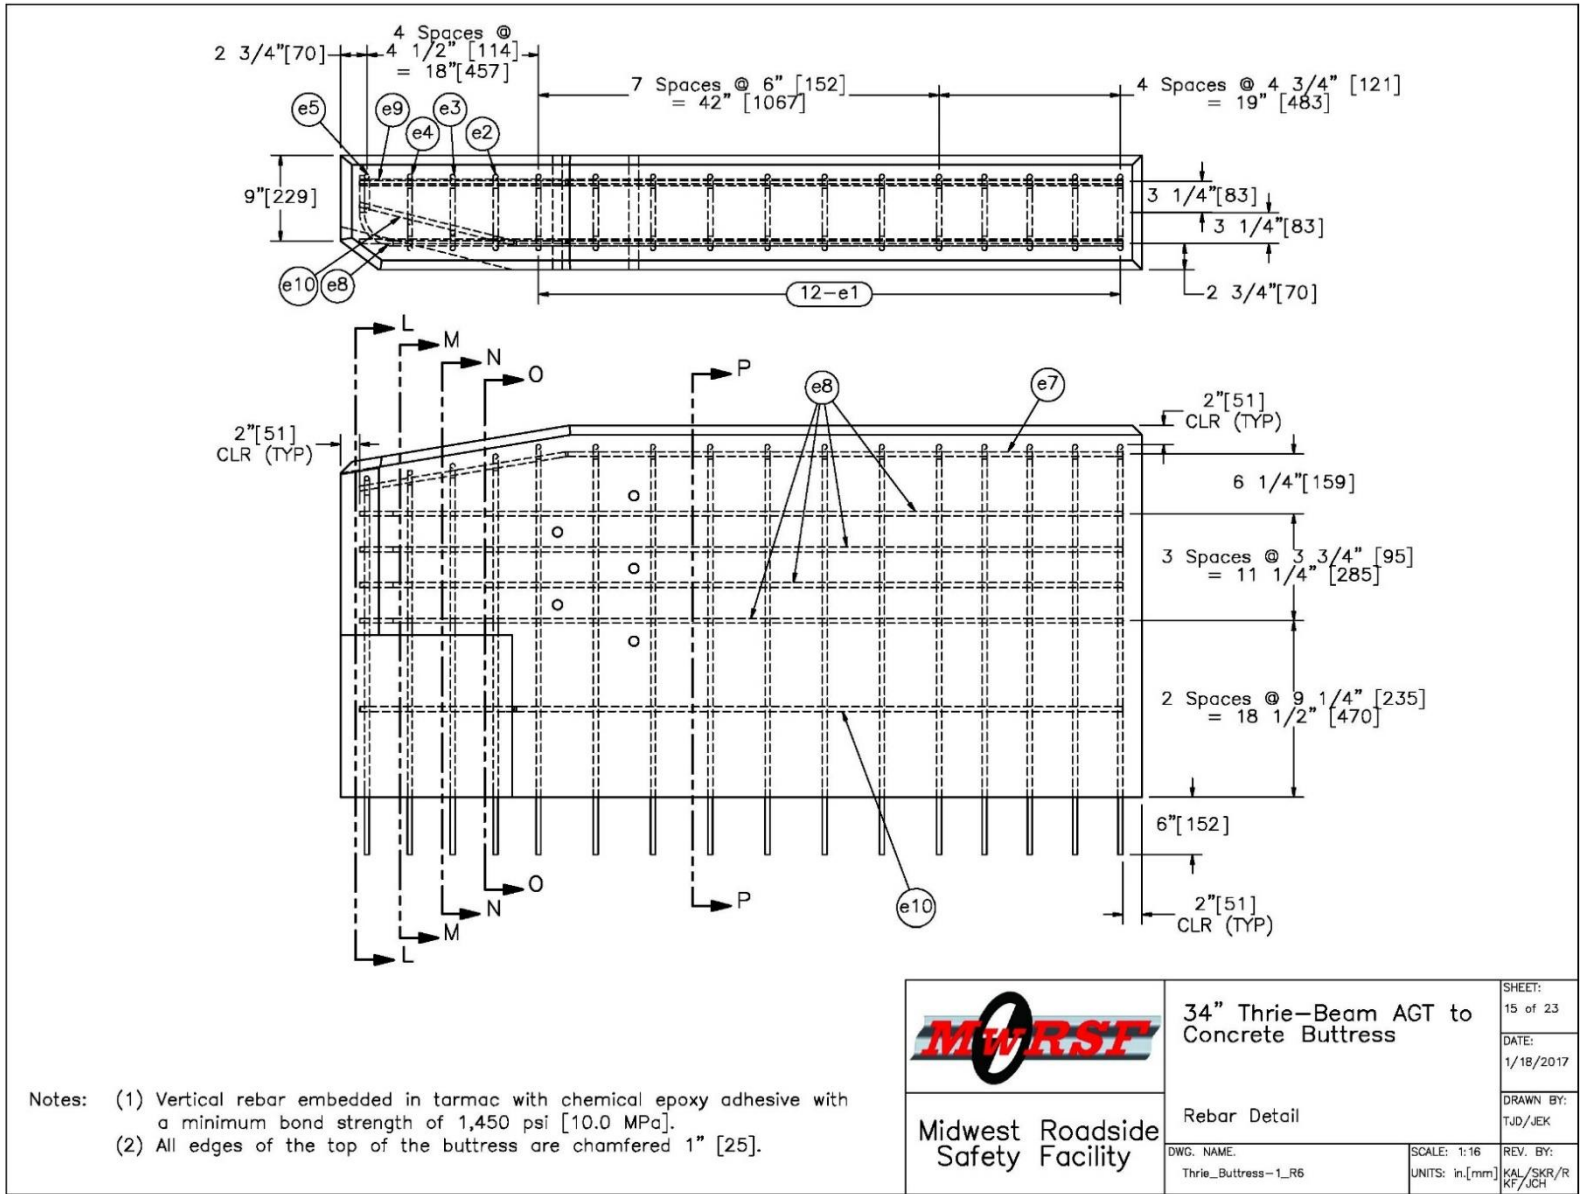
Rebar Detail, Test Nos. 34AGT-1 and 34AGT-2
